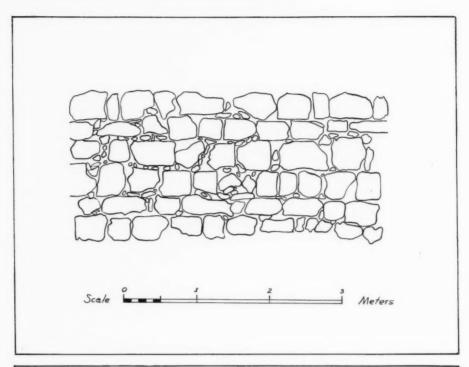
(A) Inside face of east wall of Room A (Fortresses I and II).
